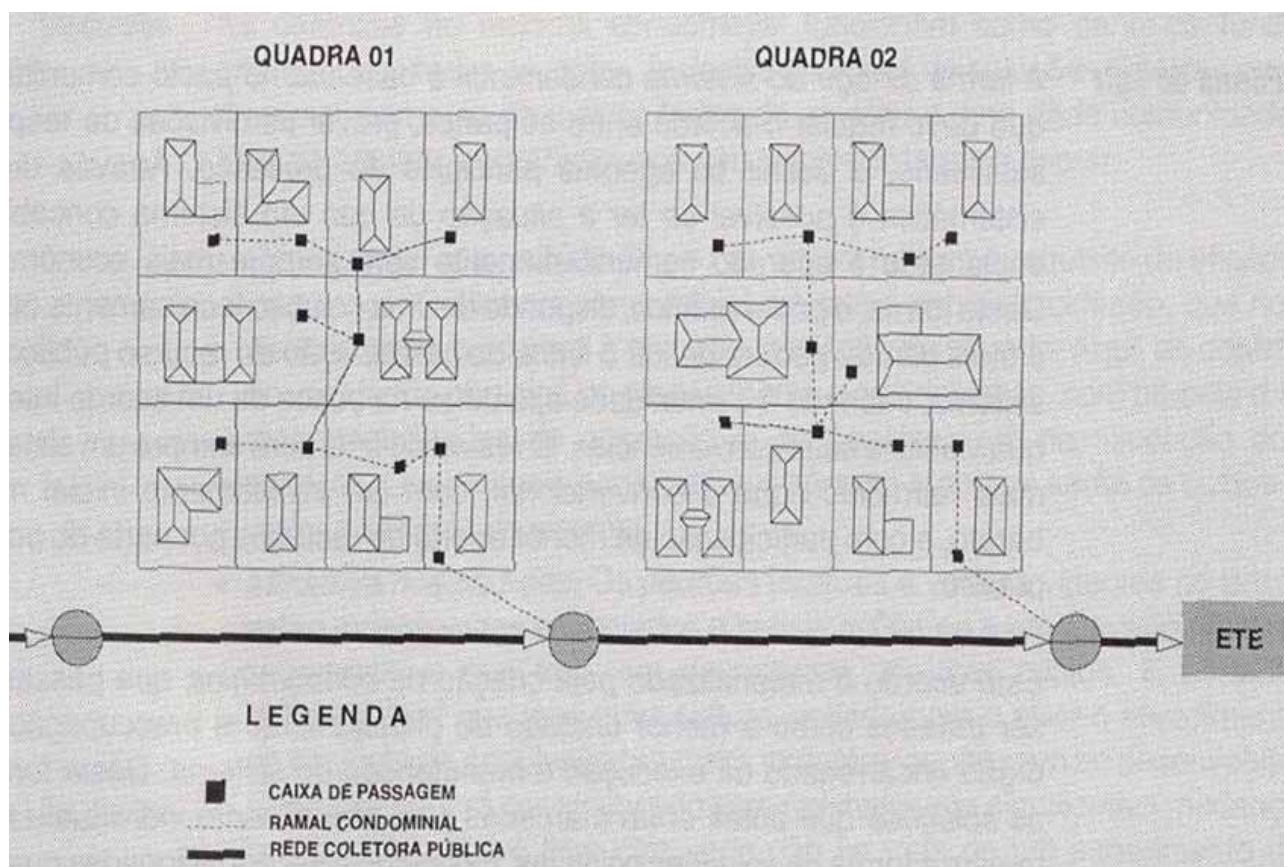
Construction plan of a simplified sewer system or condominial sewer, making use of already existing infrastructure, such as septic tanks, when available (from the urban sewerage plan, north east Brazil)
